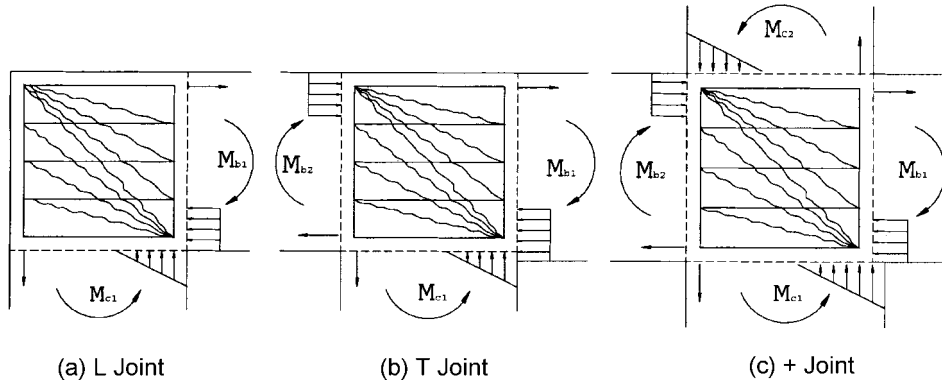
Postulated crack pattern for beam-column connections
